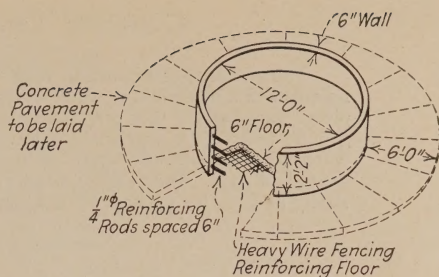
Diagram of circular watering trough showing concrete pavement to be laid later.
